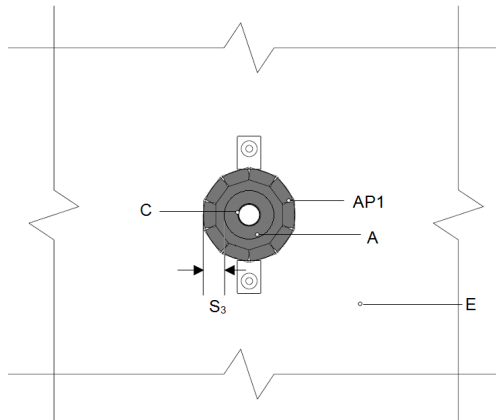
Elevation View of PE-X Pipes with Hilti Firestop Collar
